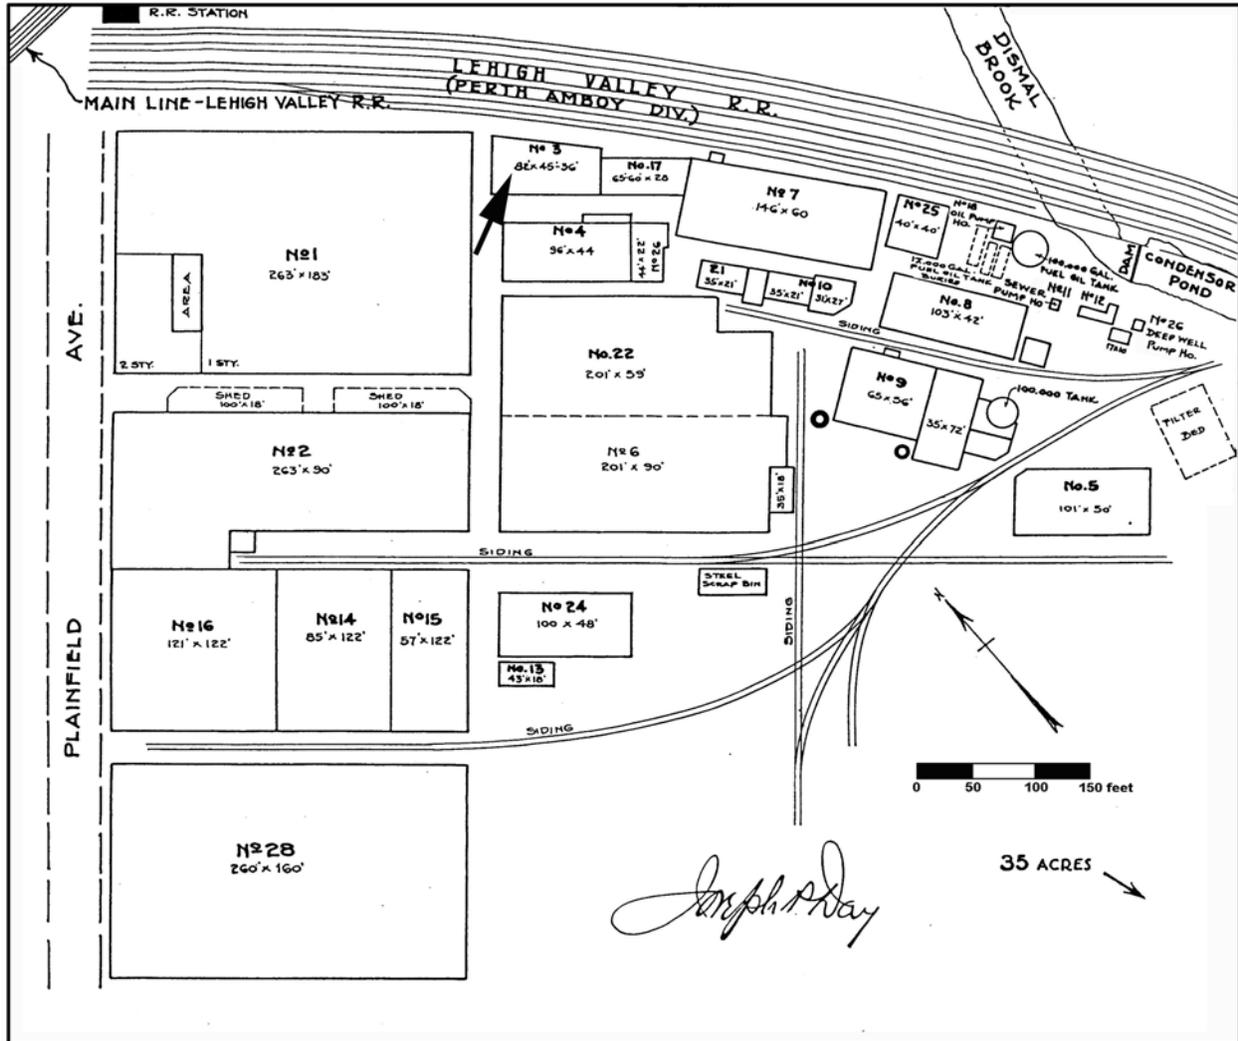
BUILDING 3 AND 1929 SOUTH PLAINFIELD WORKS
